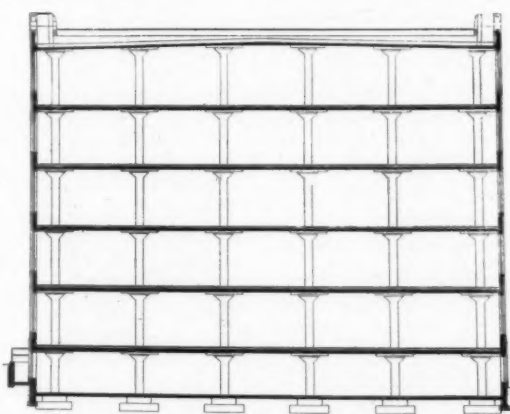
Longitudinal section of new building for James Lees & Sons Company, showing cantilever construction of floors
